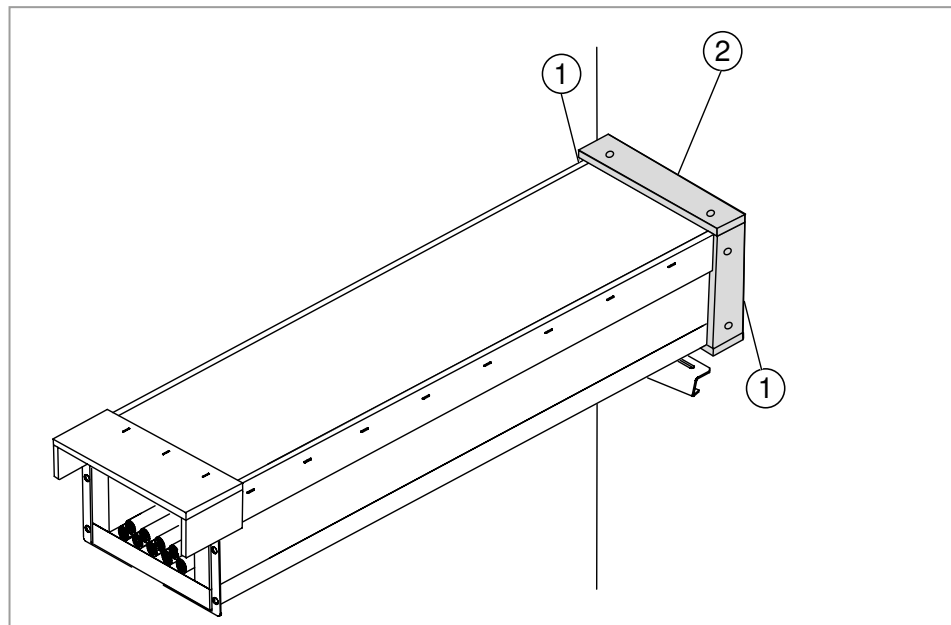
Overview, PYROLINE® Con S PLC wall connection collar
